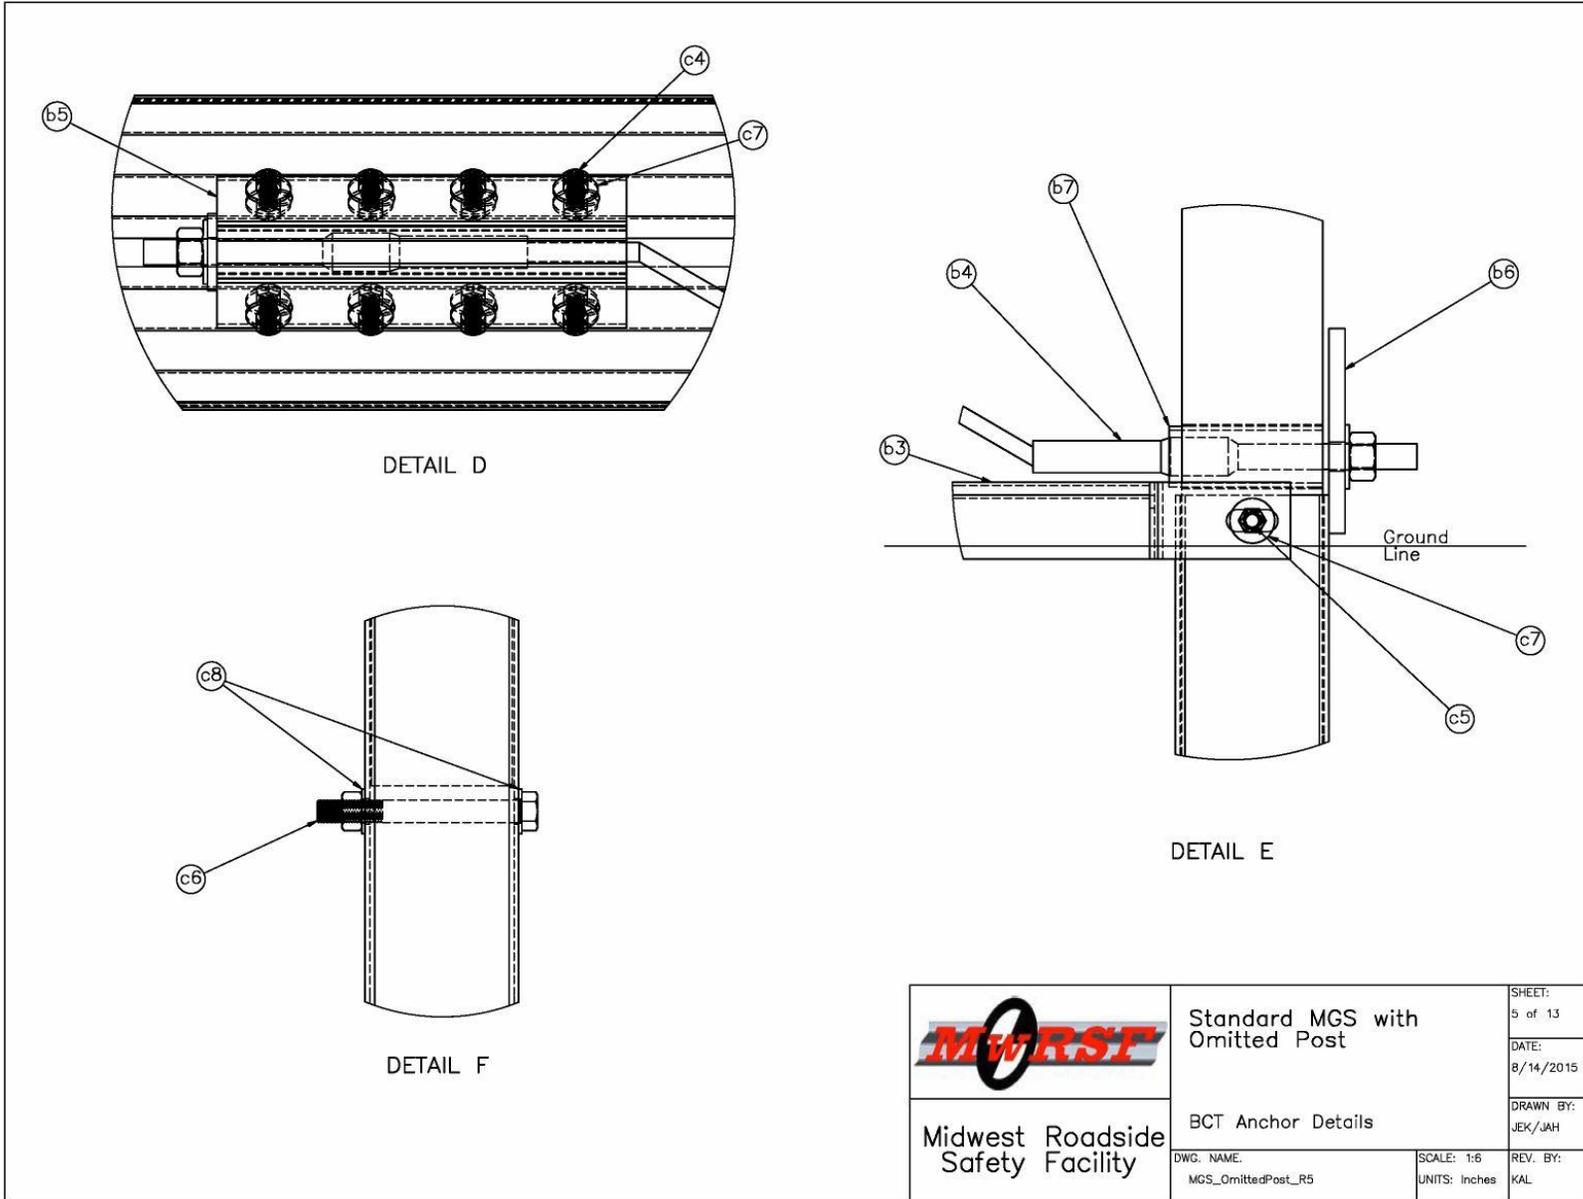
Anchorage Component Details, Test No. MGSMP-1
